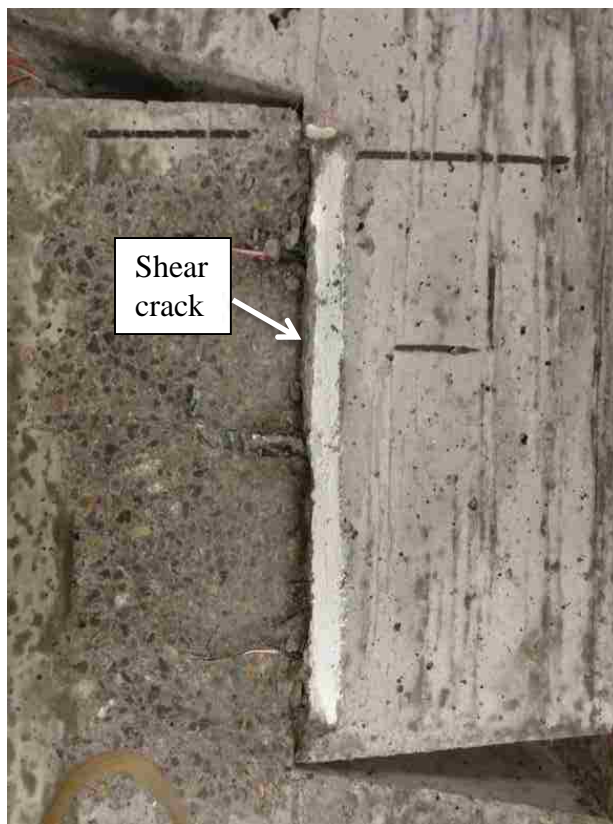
Specimen S-SL-CJ-R-22-1 with spalled concrete removed and shear plane exposed
